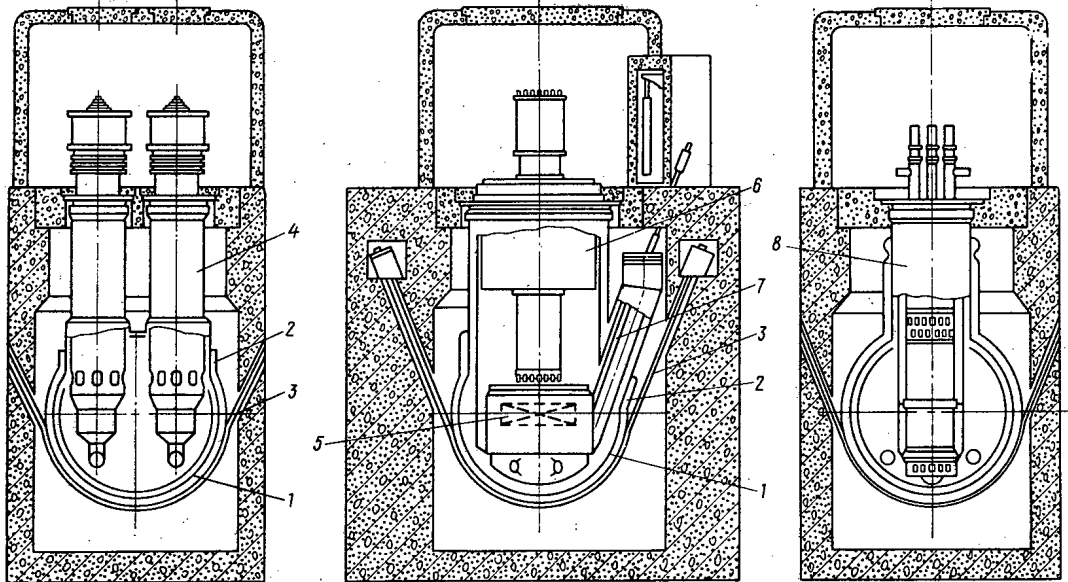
Sections of the BN-1600 reactor through the main plant: 1) reactor housing; 2) "insurance" casing; 3) reactor suspension; 4) pump; 5) core; 6) rotatable plugs; 7) elevator; 8) heat exchanger.
